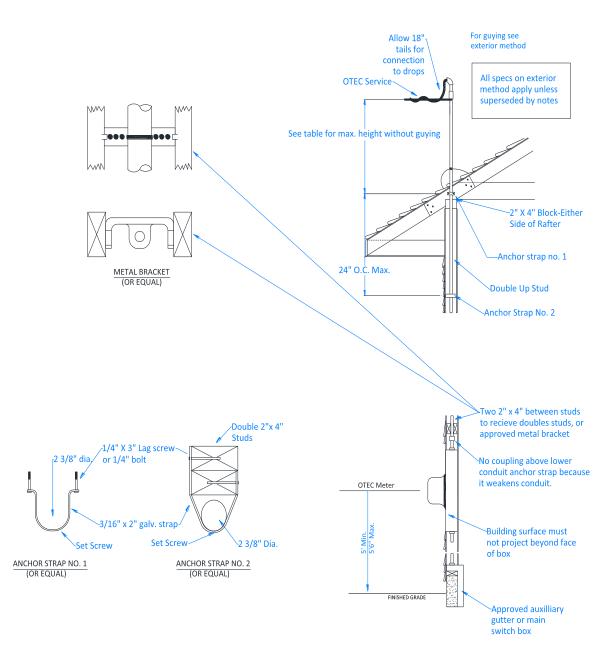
Single-Phase Self-Contained Recessed Metering Method
